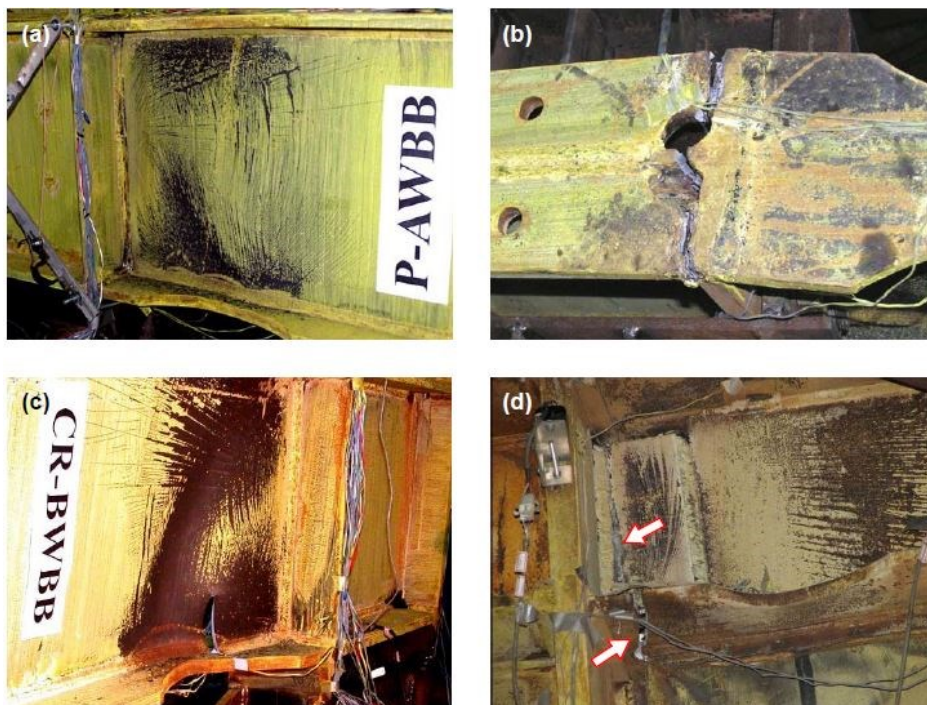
Flexural failure of boundary elements: (a) Plastic hinge development; (b) Weld connection fracture; (c) Fracture at RBS connection (the first three photos from Vian and Bruneau 2004); (d) Shear tab fracture (Qu and Bruneau 2009)
